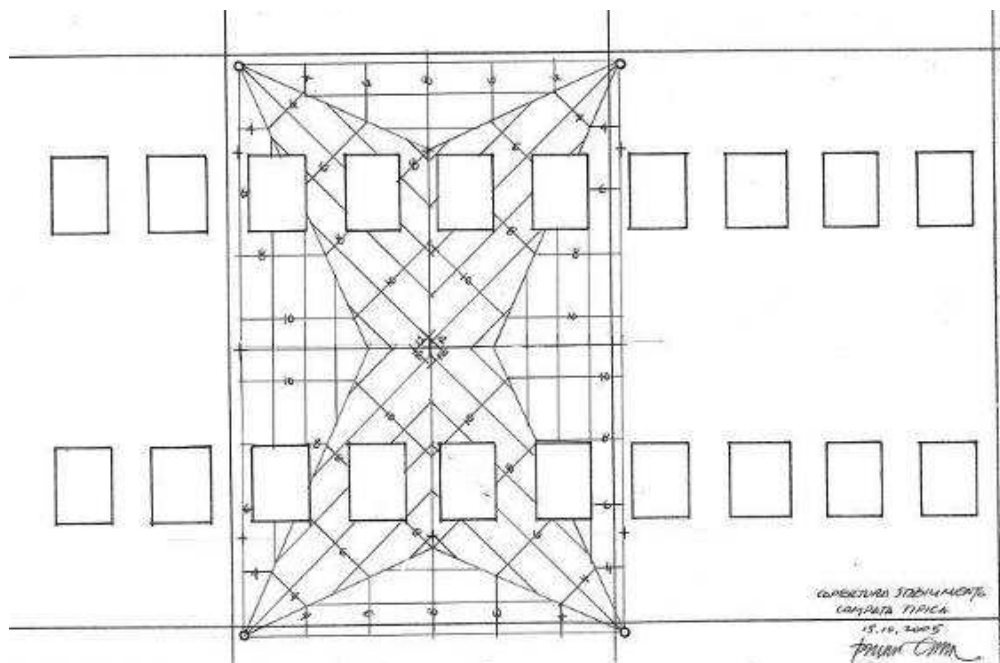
Plan of the typical span of the industrial plant (18,00 x 12,00 m), with EPS panels, used to create slopes. Numbers show panel thickness
